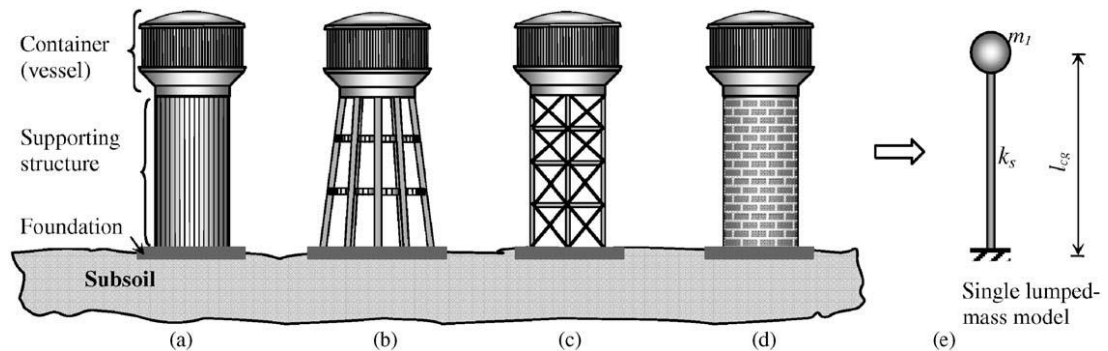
Elevated tanks and the single lumped-mass model: (a) the tank with reinforced concrete shaft supporting structure, (b) the tank with reinforced concrete frame supporting structure, (c) the tank with reinforced concrete frame with diagonal braces or steel frame supporting structure, (d) the tank with masonry shaft supporting structure, (e) single lumped-mass model. (Livaoglu and Dogangun, 2006)
